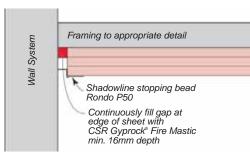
Suitable for 1, 2 and 3 layer plasterboard ceiling systems.
